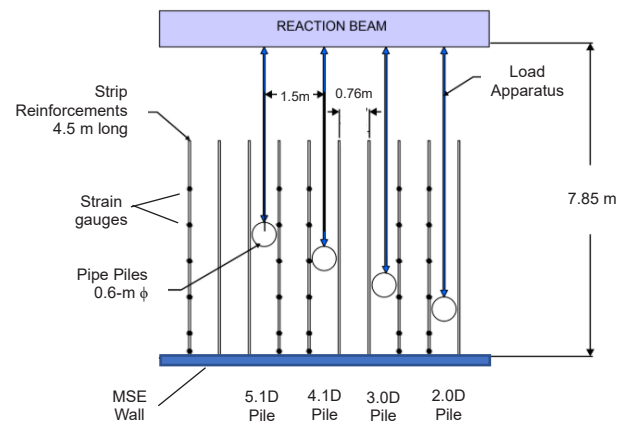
Layout of test piles relative to MSE wall and reinforcements.
